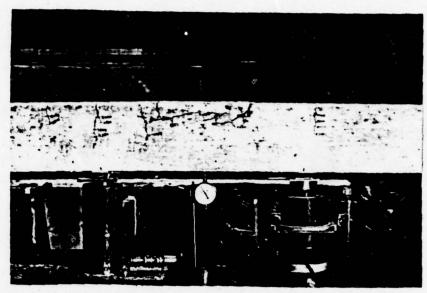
Horizontal splitting of the concrete along the reinforcement plane. Beam T-4-C at a load of 5.25 kpj.
